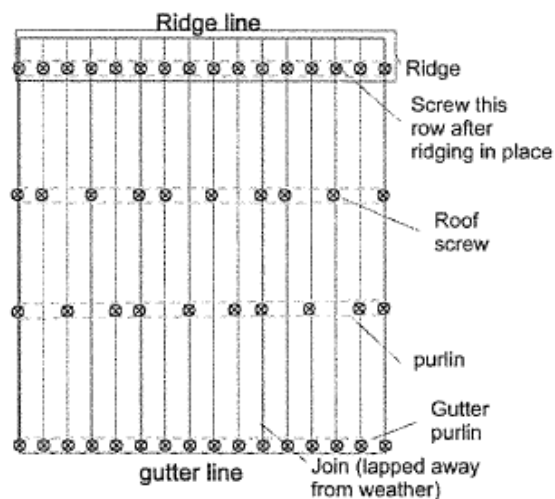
Roof screwing pattern (used with permission from Versatile Homes and Buildings)
